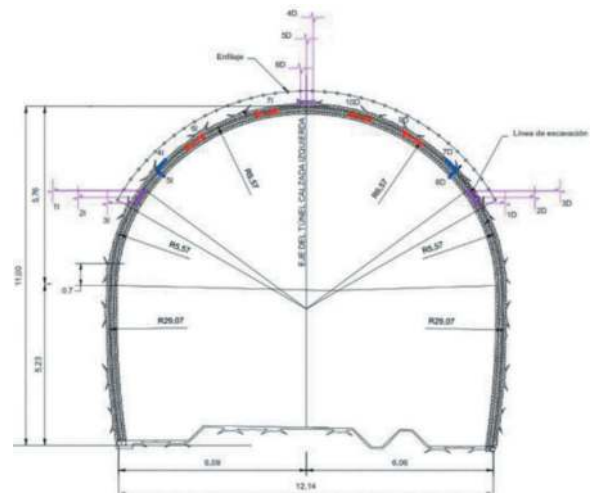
Locations for instruments in sections of the Tesalia tunnel.
